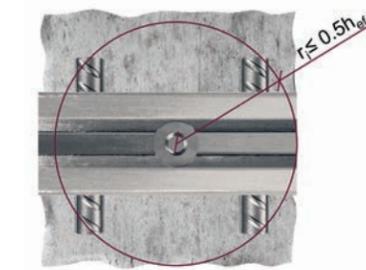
Arrangement of anchor reinforcement for anchor channels loaded in tension, plan view.
